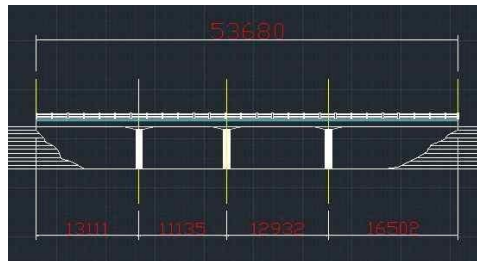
Bridge 2D floor plan in AUTO-CAD
